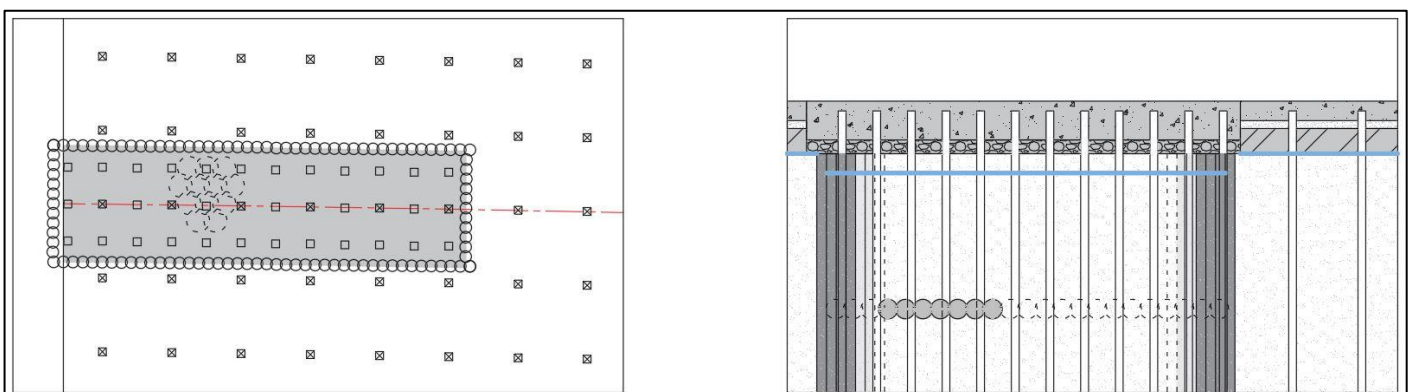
Last phase of constructing the foundation. The protruding bars are not drawn for the reasons of clarity.
